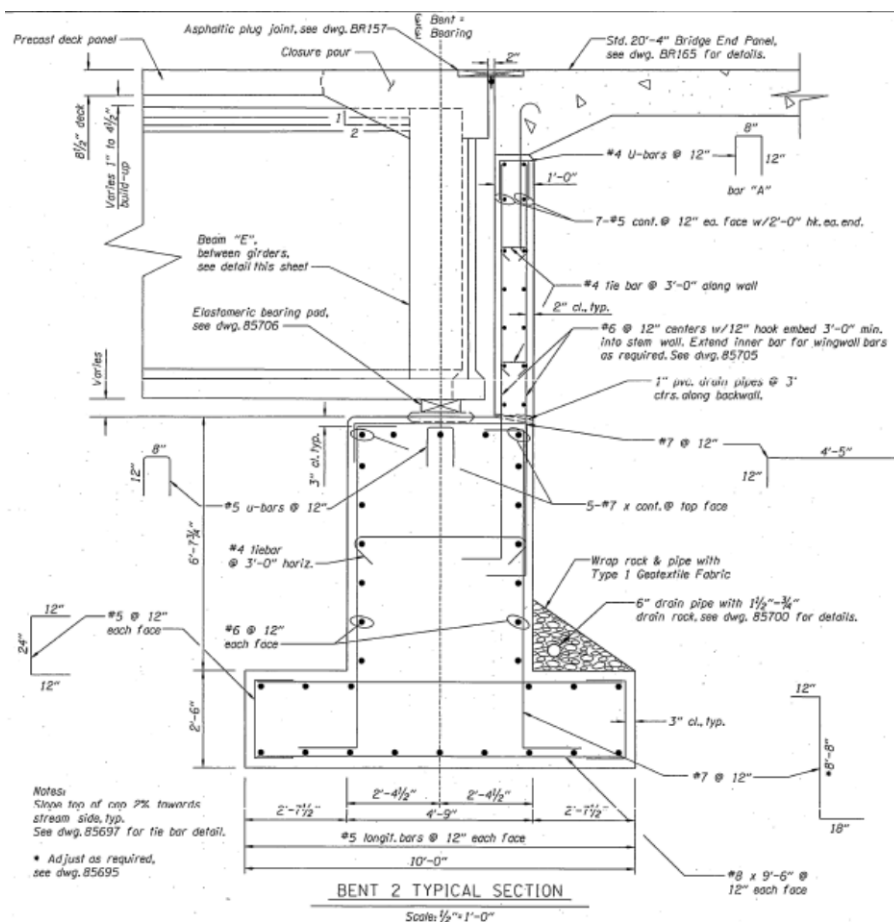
Diagram. Bent 2 typical section for bridge 21252.
